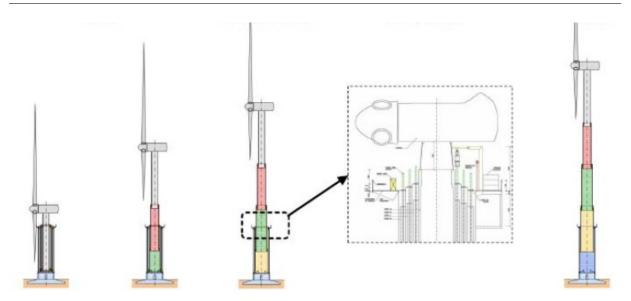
Erection procedure of the telescopic tower concept; the sections are lifted one by one with the help of reusable heavy-lift hydraulic jacks, taken from Mendizabal (2014)
